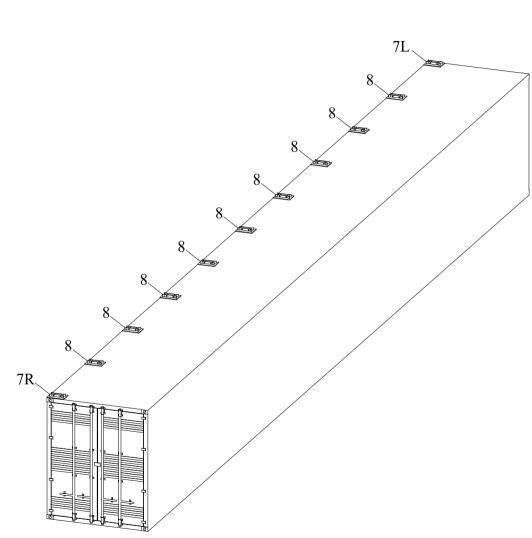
BASE PLATE FOUNDATION 3D VIEW
